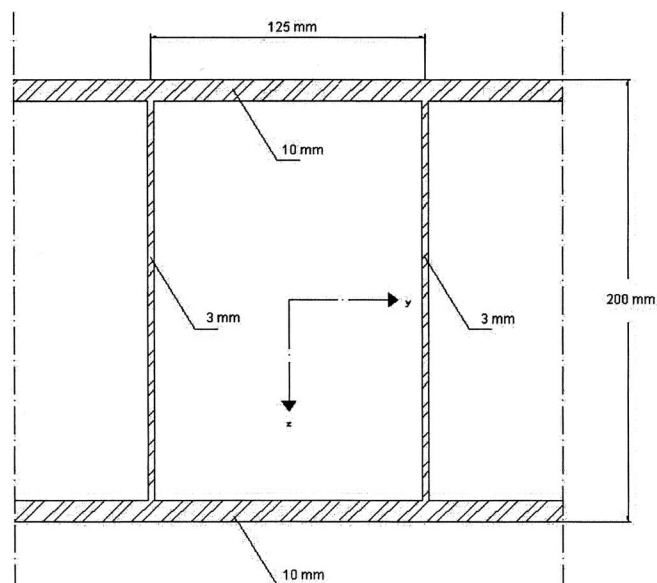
Possible wall cross-section for a safety factor of 4.0
